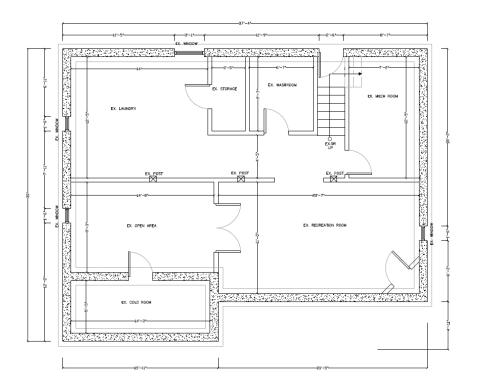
Existing Basement Plan of 18 John Street South (Mirano Design Inc., 2024)
